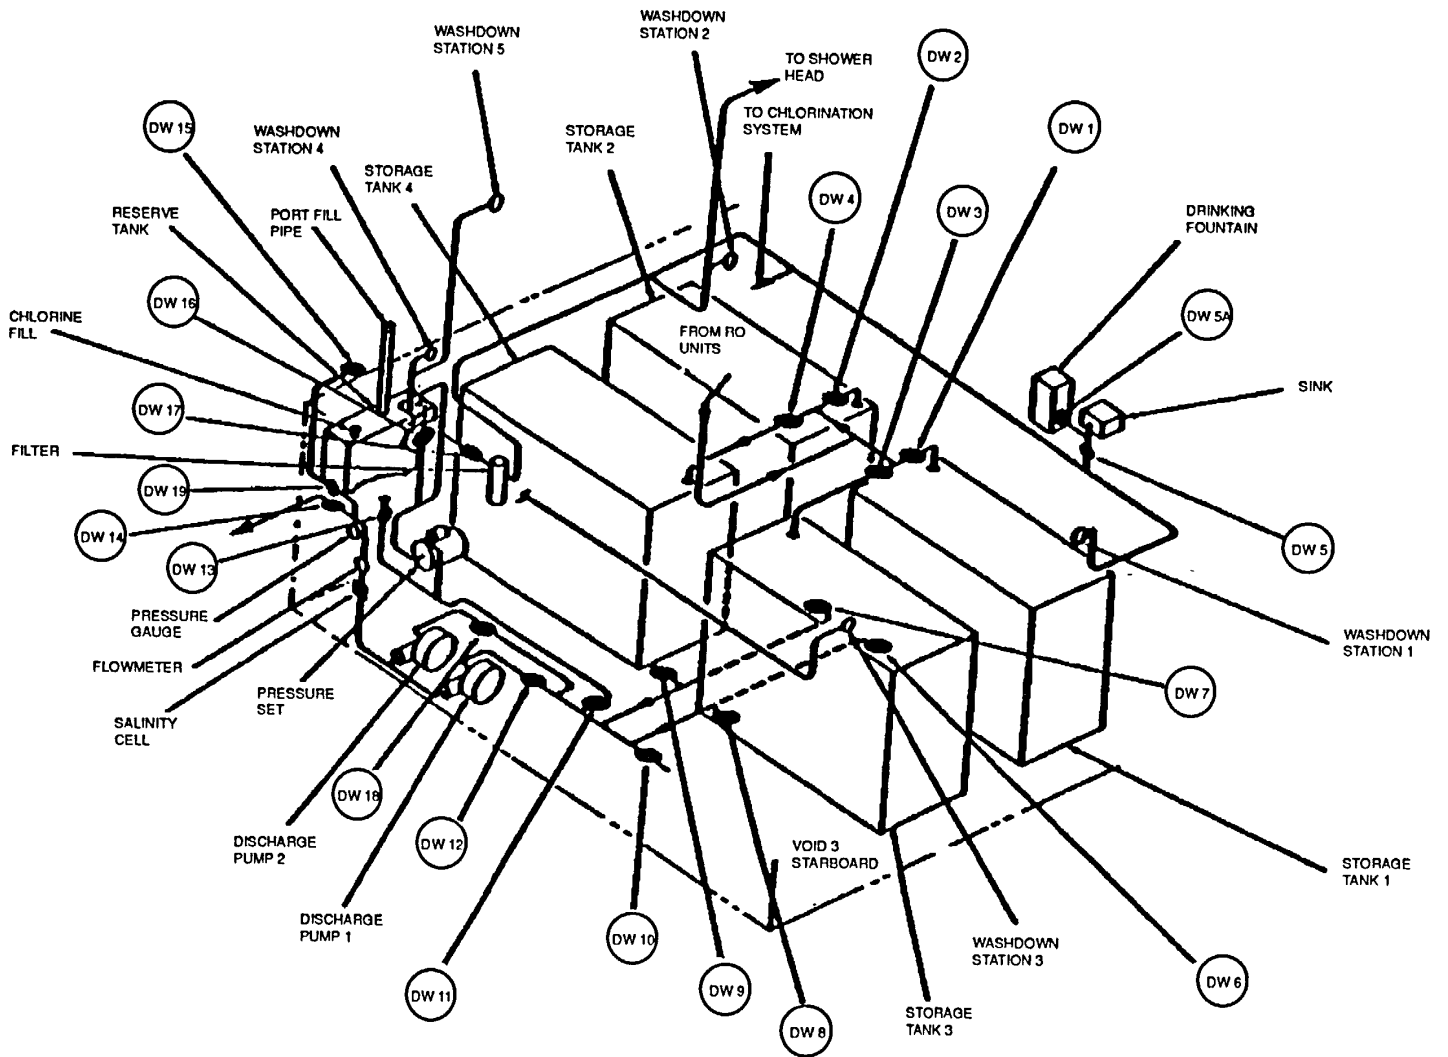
Drinking Water System Installation (Barges 2 and 3)
